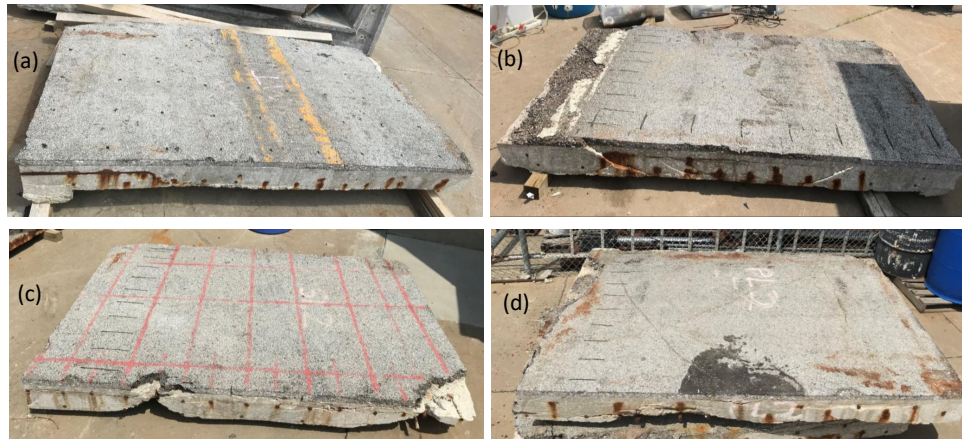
Specimens from the Big Nehama river bridge bridge (a) MT1 (b) SL1 (c) SL2 (d) PL2
